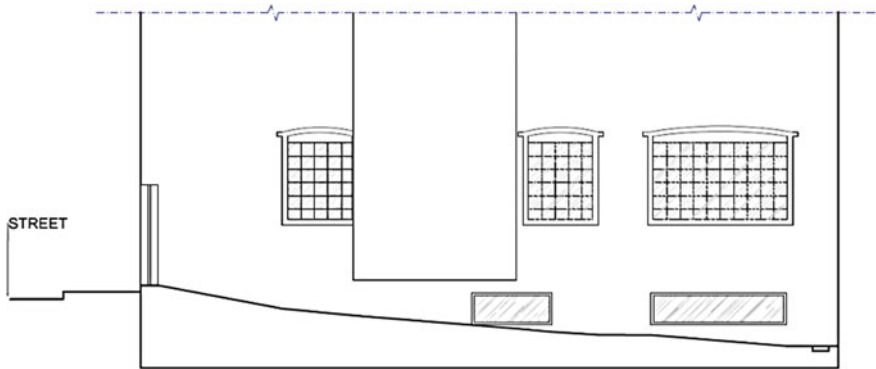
Schematic elevation—pedestrian entrance corridor—west façade
